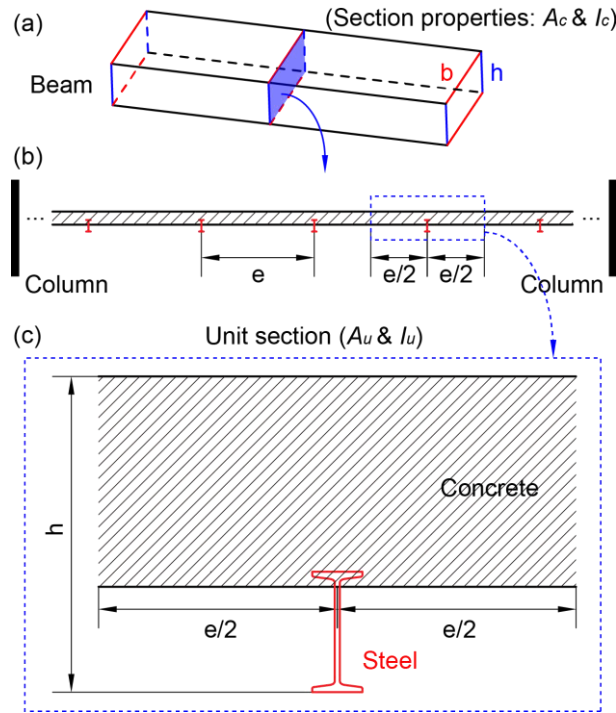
The composite cross section for a beam: (a) the cross section in a beam; (b) the composite cross section of the beam between two columns, used for the reinforced masonry buildings and the 1st floor of the unreinforced masonry buildings; (c) the chosen unit composite cross section
